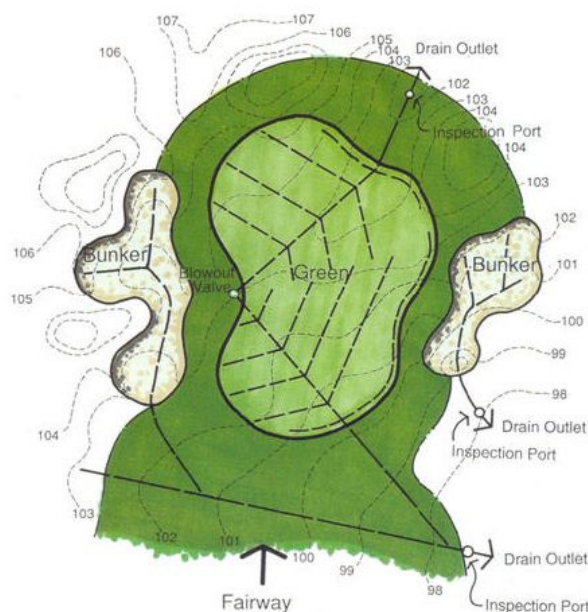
Detailed drainage-system plan for a putting green. (Courtesy of Robert Trent Jones II, American Society of Golf Course Architects.)
